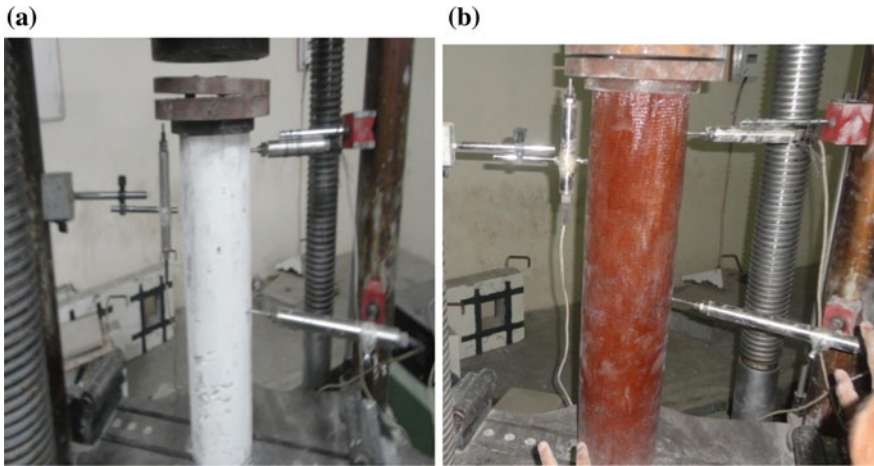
Laboratory test setup for RC columns a unwrapped specimen, b wrapped specimen
